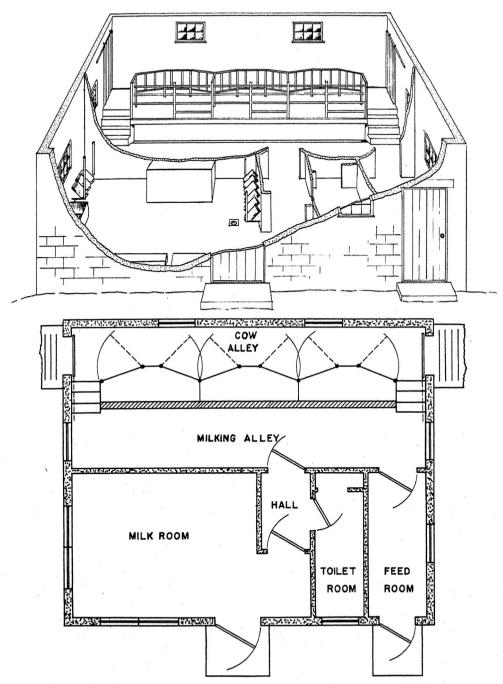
Tandem Arrangement, Elevated-Platform Milking Barn and Milk House Combination (Mo. Plan No. 17-23-C1).
